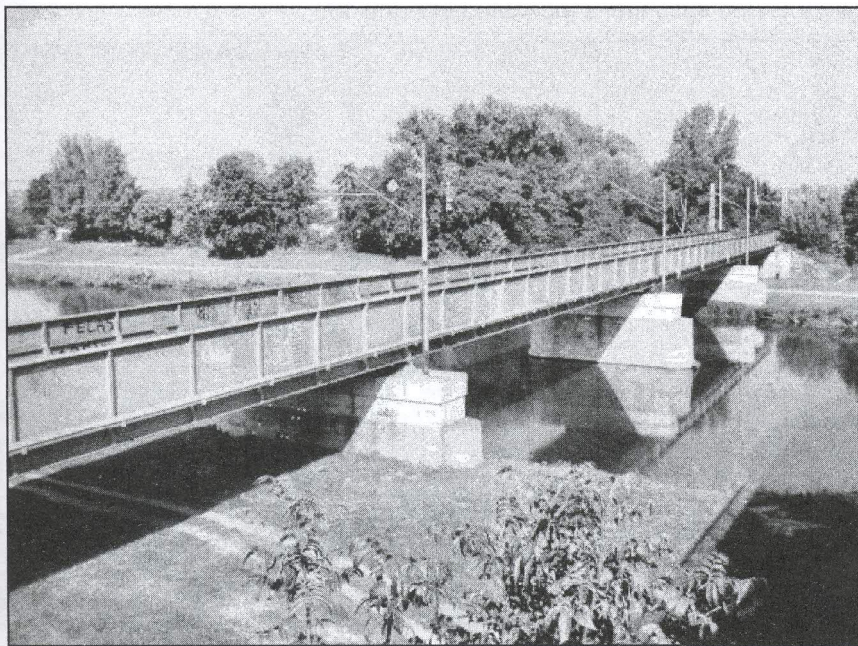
Railway bridge, Rosice nad Labem – Hradec Králové (Czech Republic)
